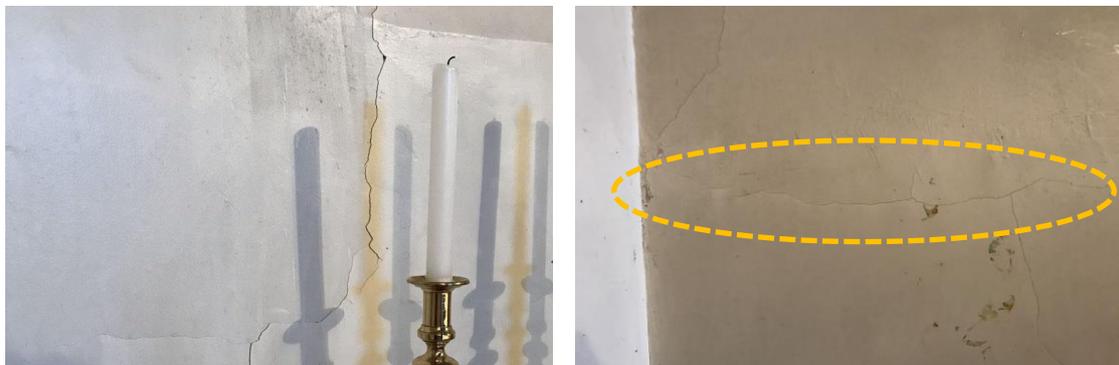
Left: Cracking in wall. Right: Numerous cracks running from main horizontal crack.
